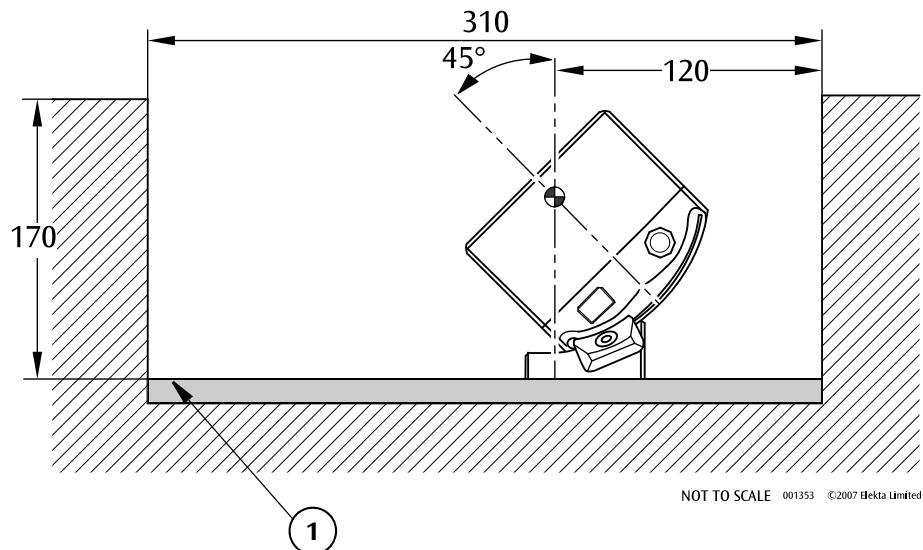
Tilted LAP laser hole dimensions (plan view)
